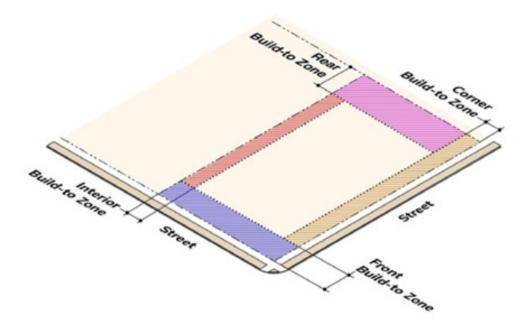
Illustration depicting the Front Build-To Zone, Interior Build-To Zone, Corner Side Build-To Zone, and Build-To Zone on a lot.
